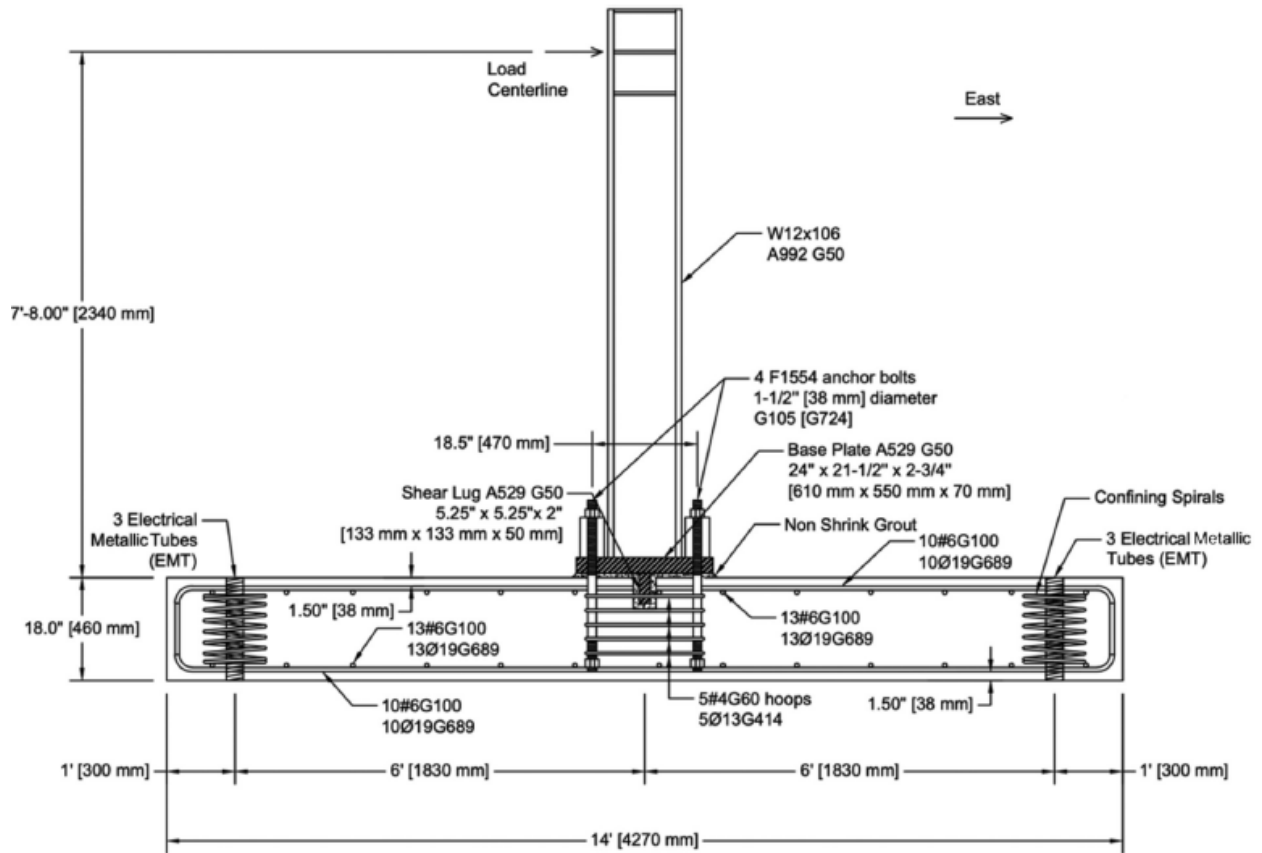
Steel-column-to-concrete-foundation joint specimen M01 (Worsfold et al. 2022)
